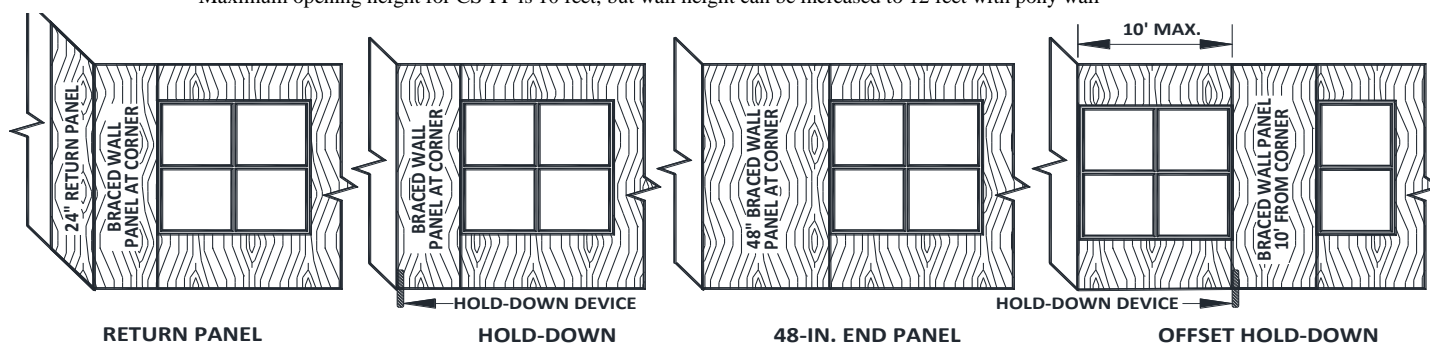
CONTINUOUS-SHEATHING CORNERS
